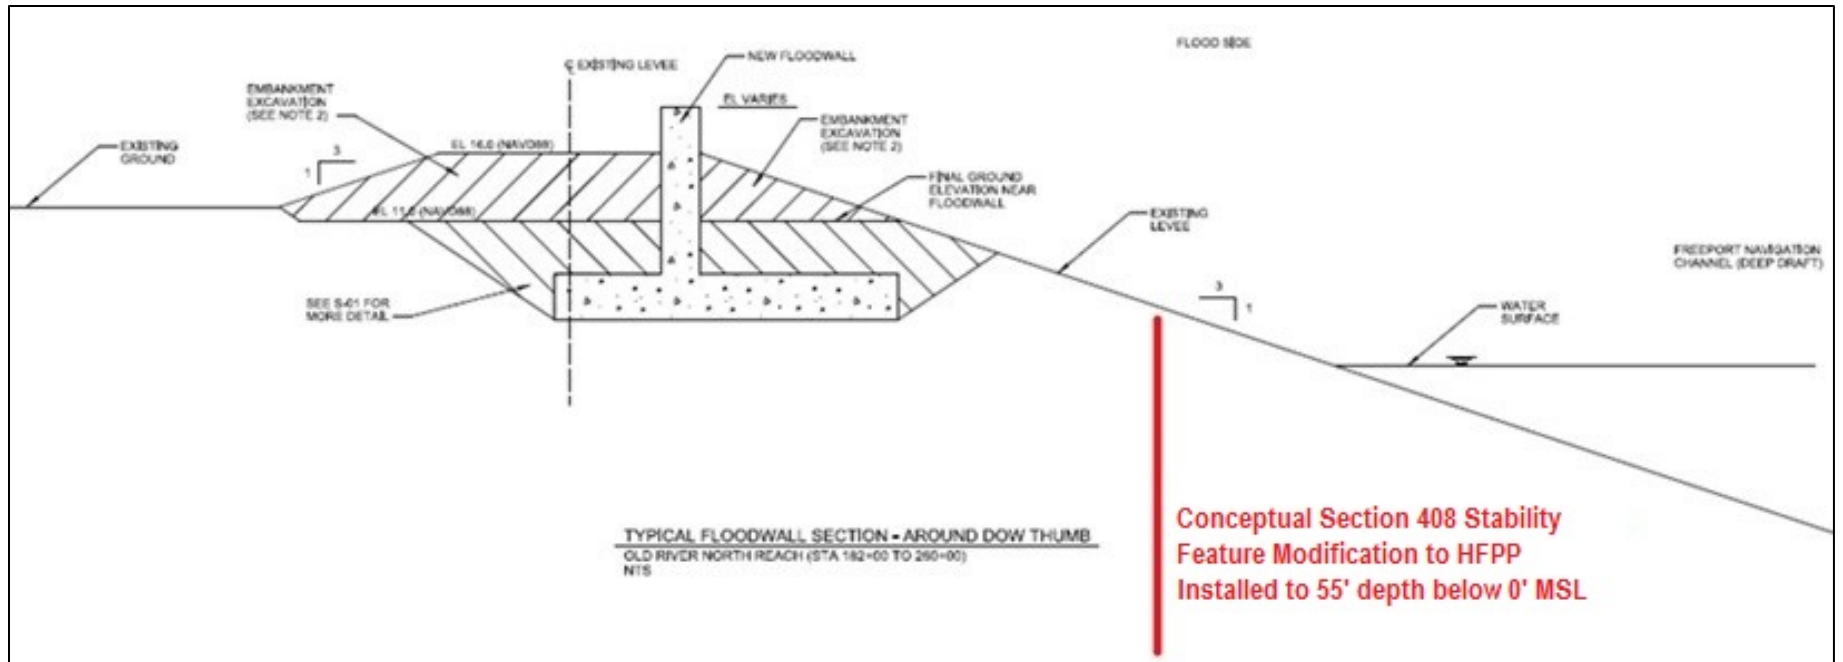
S2G Typical Floodwall Section and Section 408 Modifications required for GRR Recommended Plan
